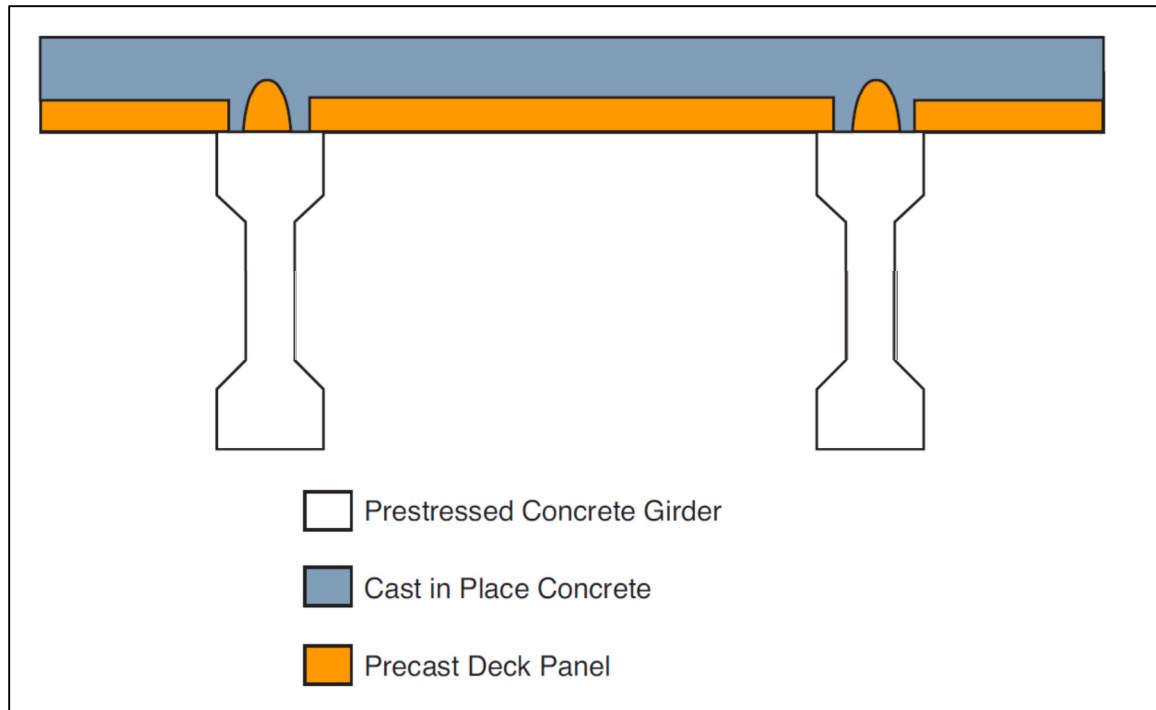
Precast, prestressed concrete panel bridge deck system. (Folliard, Smith, Sellers, Brown, & Breen, 2003)
